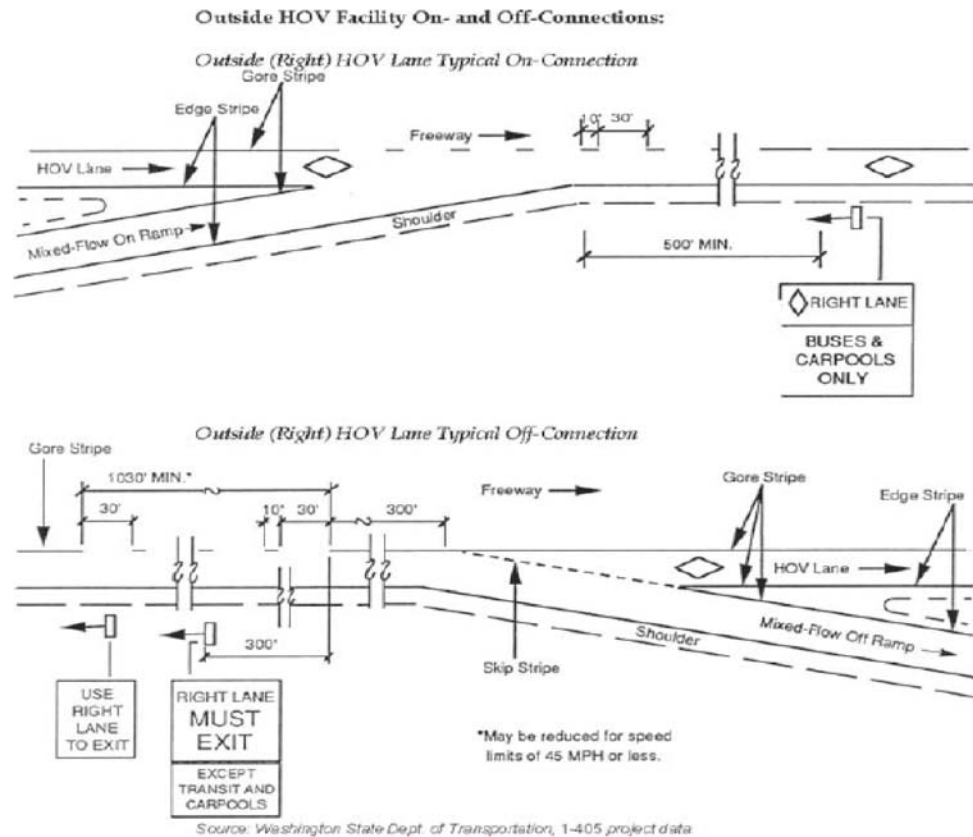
Washington State DOT transit/carpool lane signing and pavement marking layouts.
